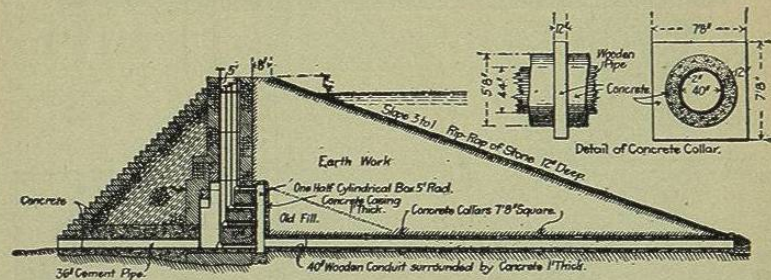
CASTLEWOOD DAM, COLO. SECTION AFTER RECONSTRUCTION.
